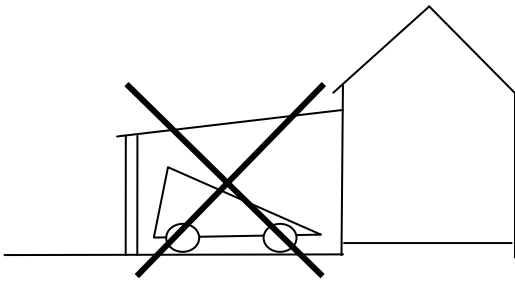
No garage extensions are permitted beyond the front street-facing facade of the dwelling unit
